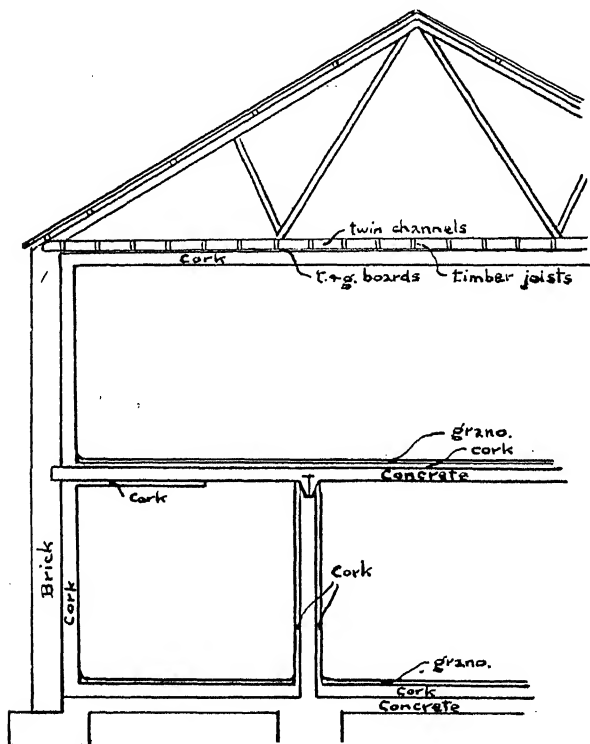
RIBBON INSULATION AND SUSPENDED CEILING
